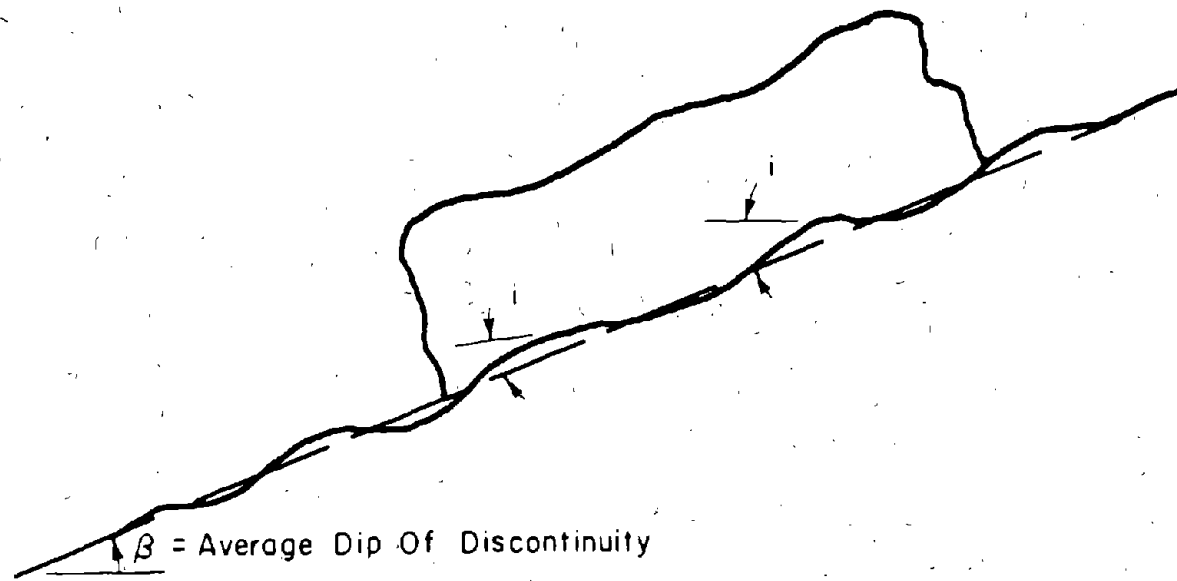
Sketch of a rock mass resting on an inclined irregular discontinuity. From D. U. Deere, A. J. Hendron, Jr., F. D. Patton, and E. J. Cording, Design of surface and near-surface construction in rock, Failure and Breakage of Rock, C. Fairhurst, ed., AIME, New York, 1967.
